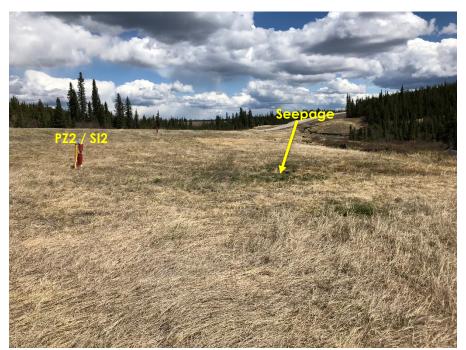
Seepage south of PZ2 / SI2. Looking east.
